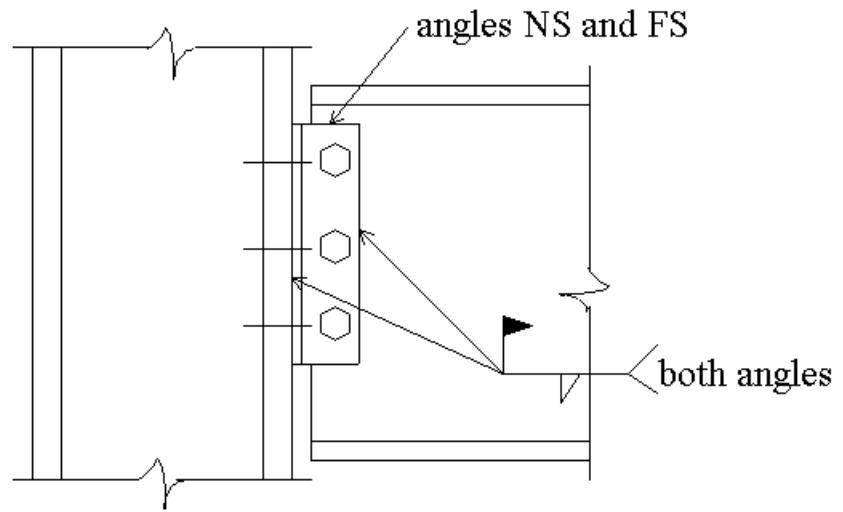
Fillet Weld Reinforcement
